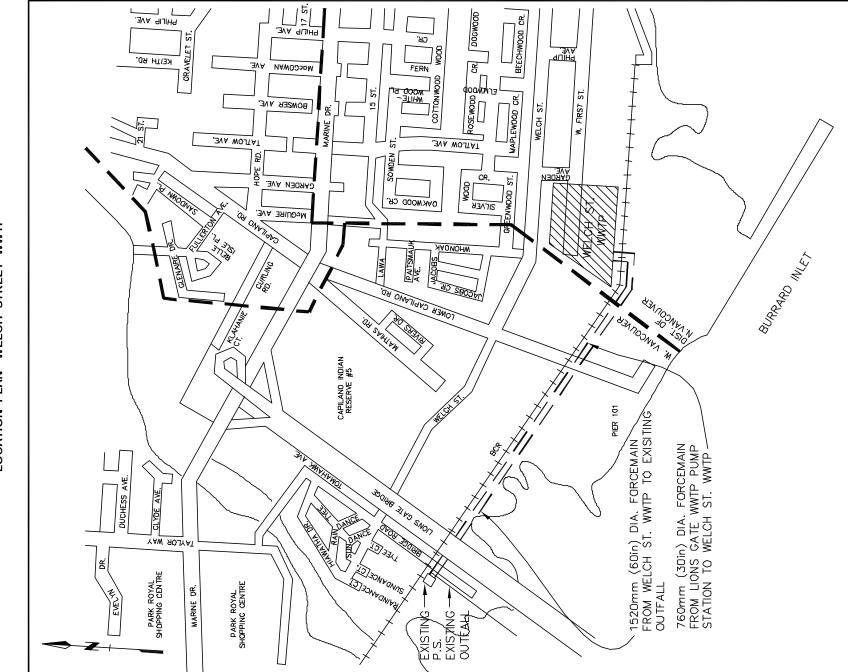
LIONS GATE WASTEWATER TREATMENT PLANT LOCATION PLAN - WELCH STREET WWTP
